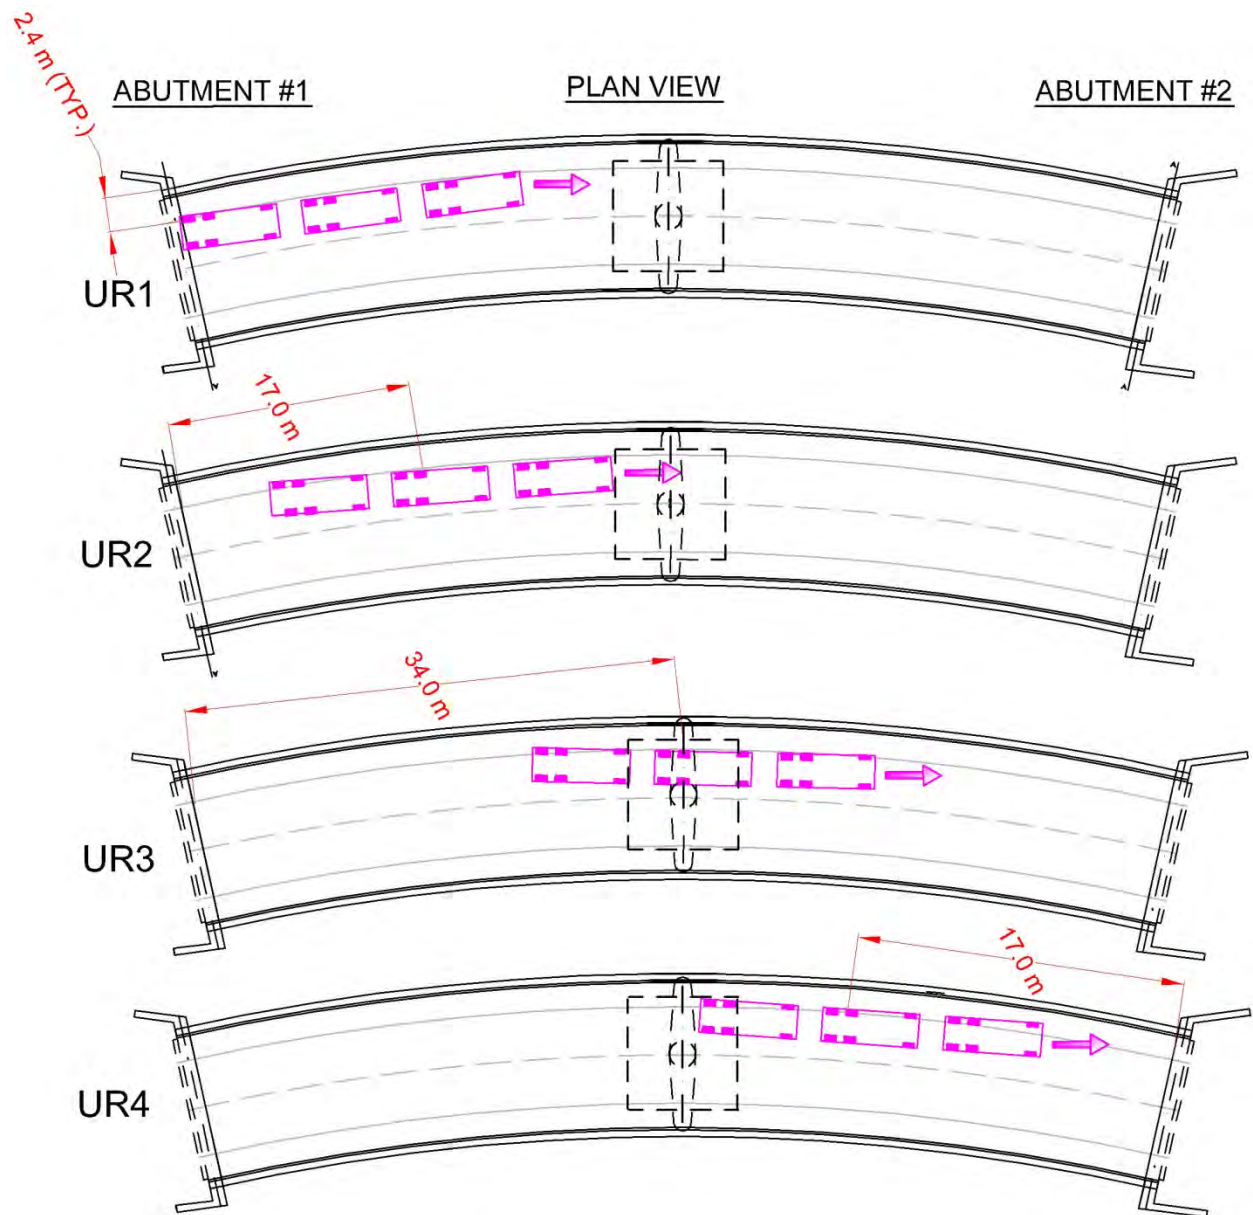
Stockbridge Load Testing Truck Locations (Upstream – Reverse)
